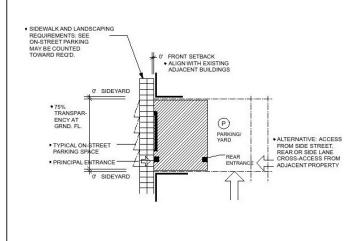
Site plan for typical small infill site showing alternative access to parking.
